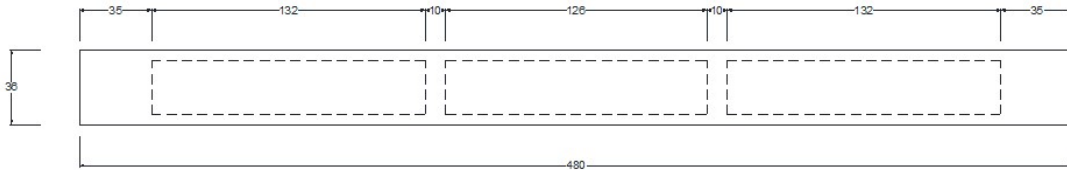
Dimensions of the in-service bridge's prestressed concrete box beam.
